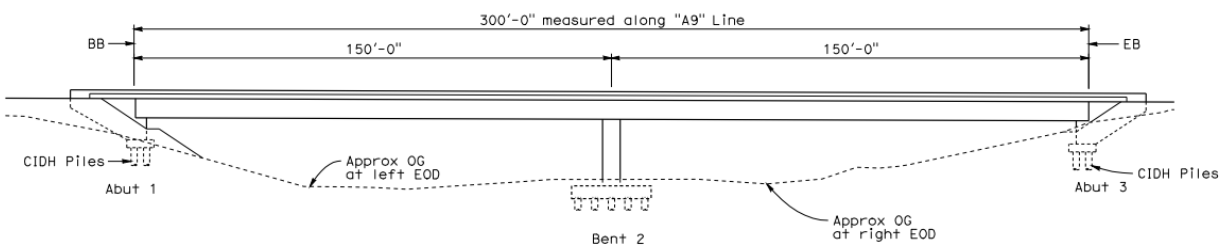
Schematic Elevation view of OSB2 bridge (Caltrans)
